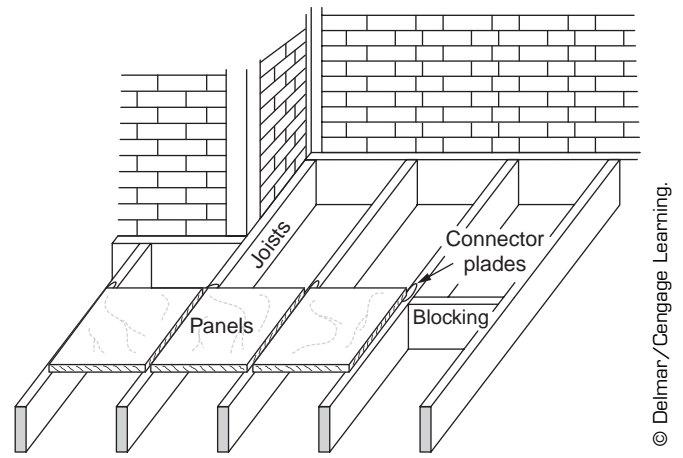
Installation of additional blocking every 5 feet for composite deck surfacing.
